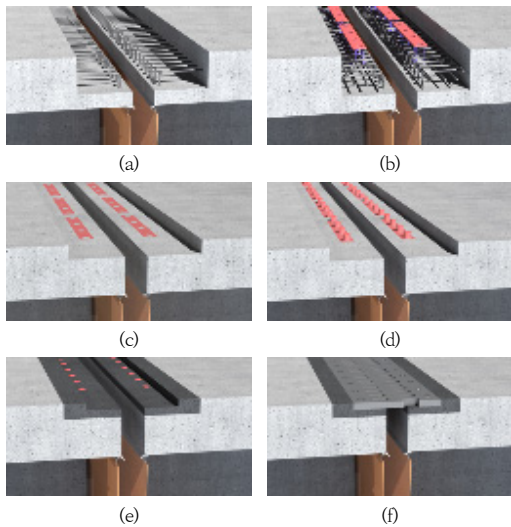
Rendered replacement process of expansion joint using precast concrete
